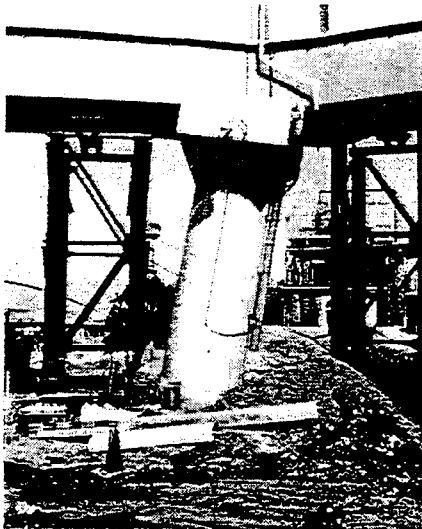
Inclined concrete pier due to ground displacement (A in Fig. 6)
